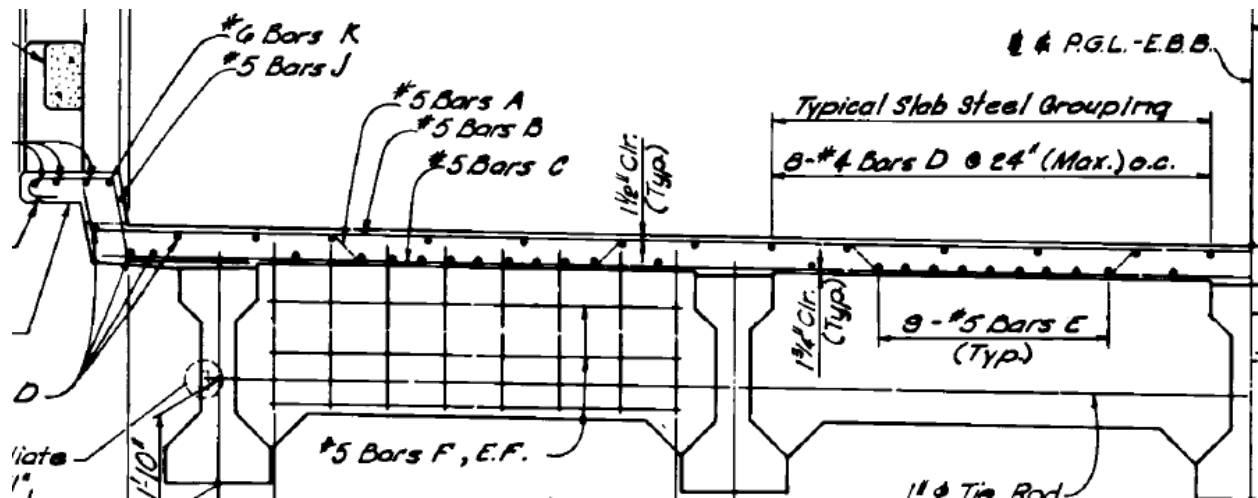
Construction plan showing typical section of bridge deck with reinforcement schedule.²⁸
